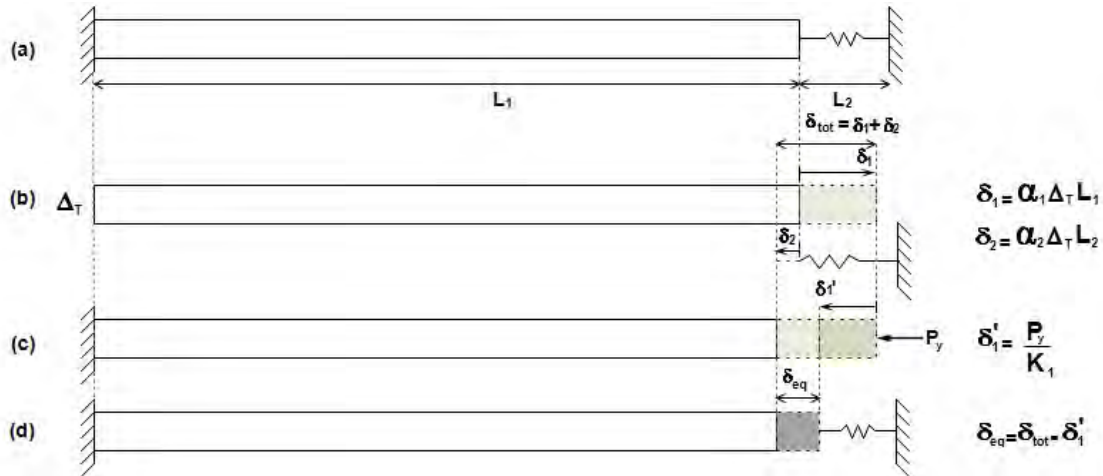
Bridge and BRB thermal expansion considering the effective span L_1
